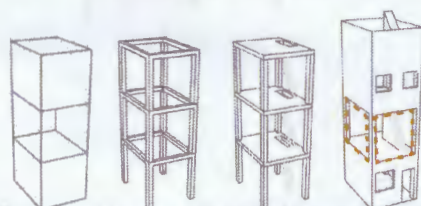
3 story house with in-fill void (www.archdaily.com)
